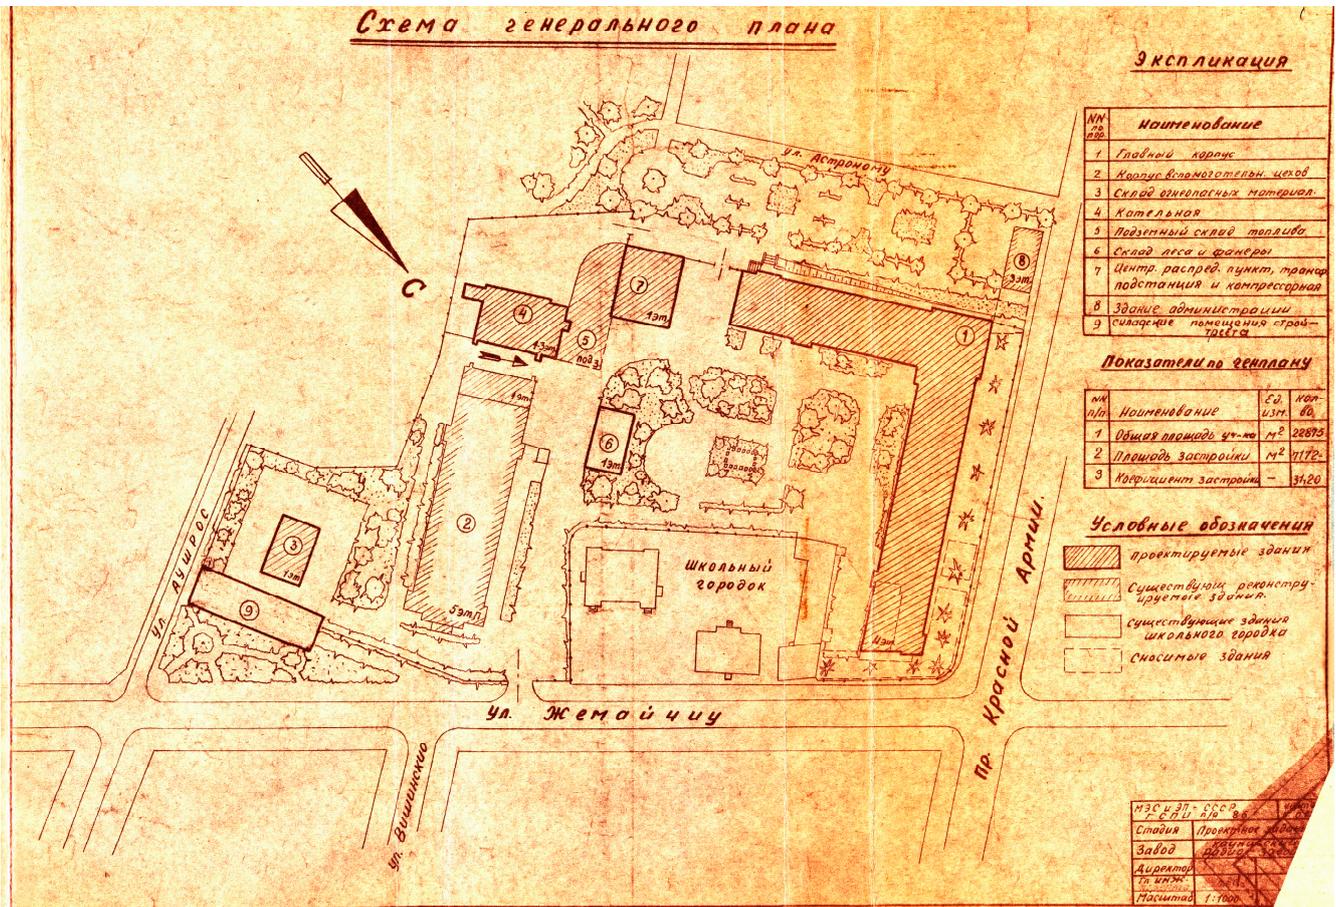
The General Plan scheme of the Kaunas Radio Factory, 1957. (1) Main factory building; (2) Building of auxiliary workshops; (3) Flammable material storage; (4) Boiler room; (5) Underground fuel storage tanks; (6) Plywood warehouse; (7) Electrical substation; (8) Administration buildings (source: Lithuanian Central State Archives).
